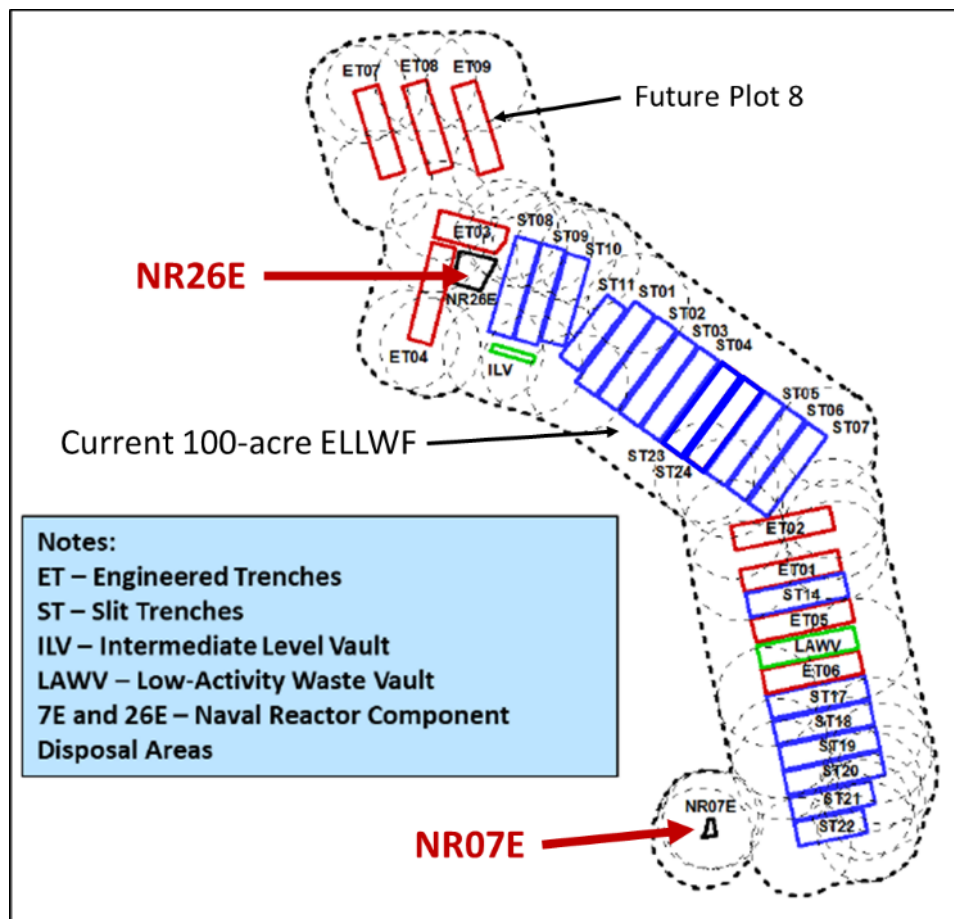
E-Area Low-Level Waste Facility Layout Showing NR26E, NR07E, and Adjacent Units (Hang and Hamm, 2022)
